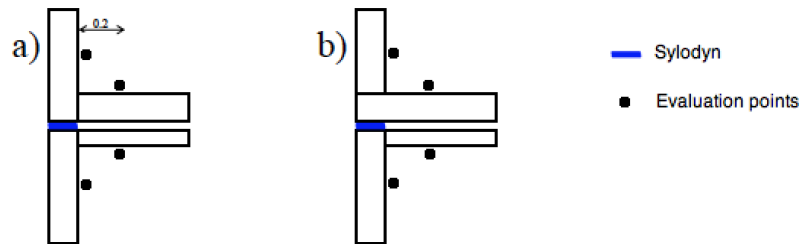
Different Sylodyn positions: (a) floor and ceiling installed between the walls and (b) floor installed upon walls. The evaluation points are dots in the figure (6 evaluation points along each line are considered).
